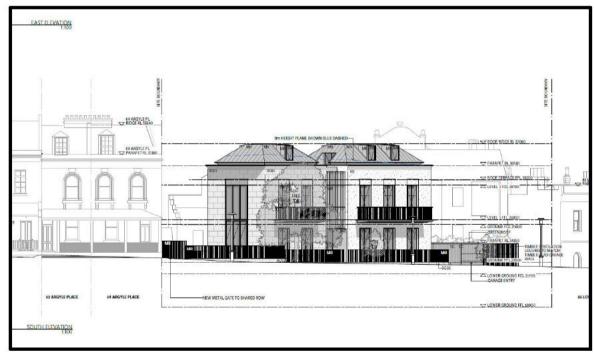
Proposed south elevation showing windows facing 64 Argyle Place (Source: Andrew Burns Architecture)
